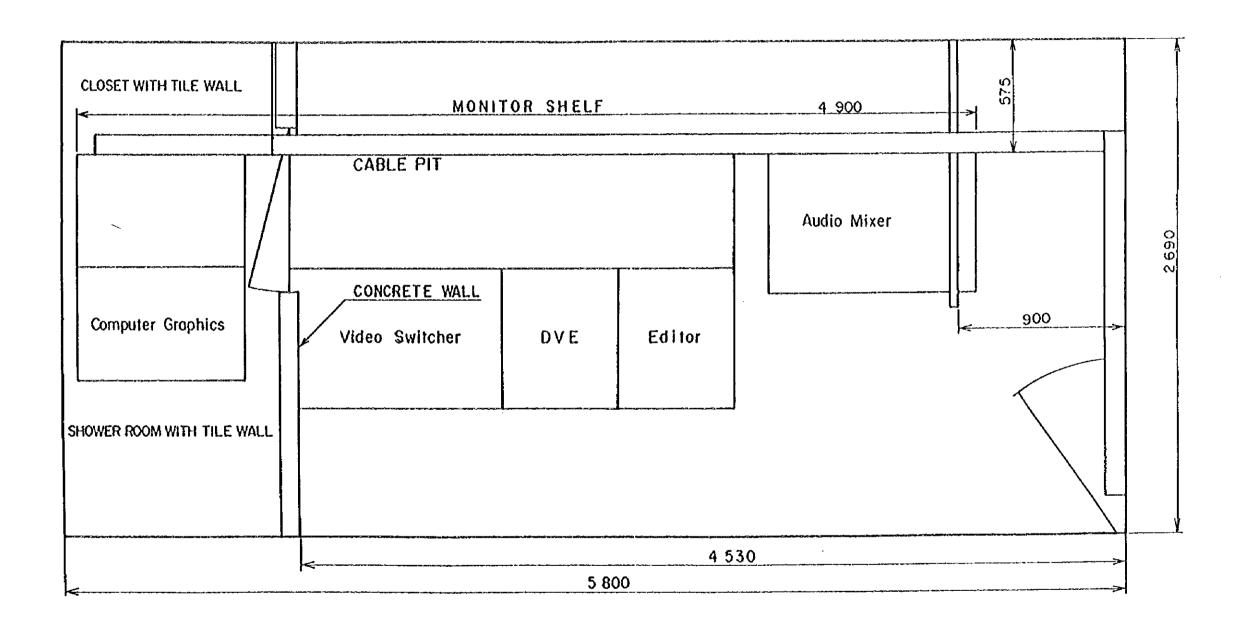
Floor Layout of Production Room in Colombo Studio Center
